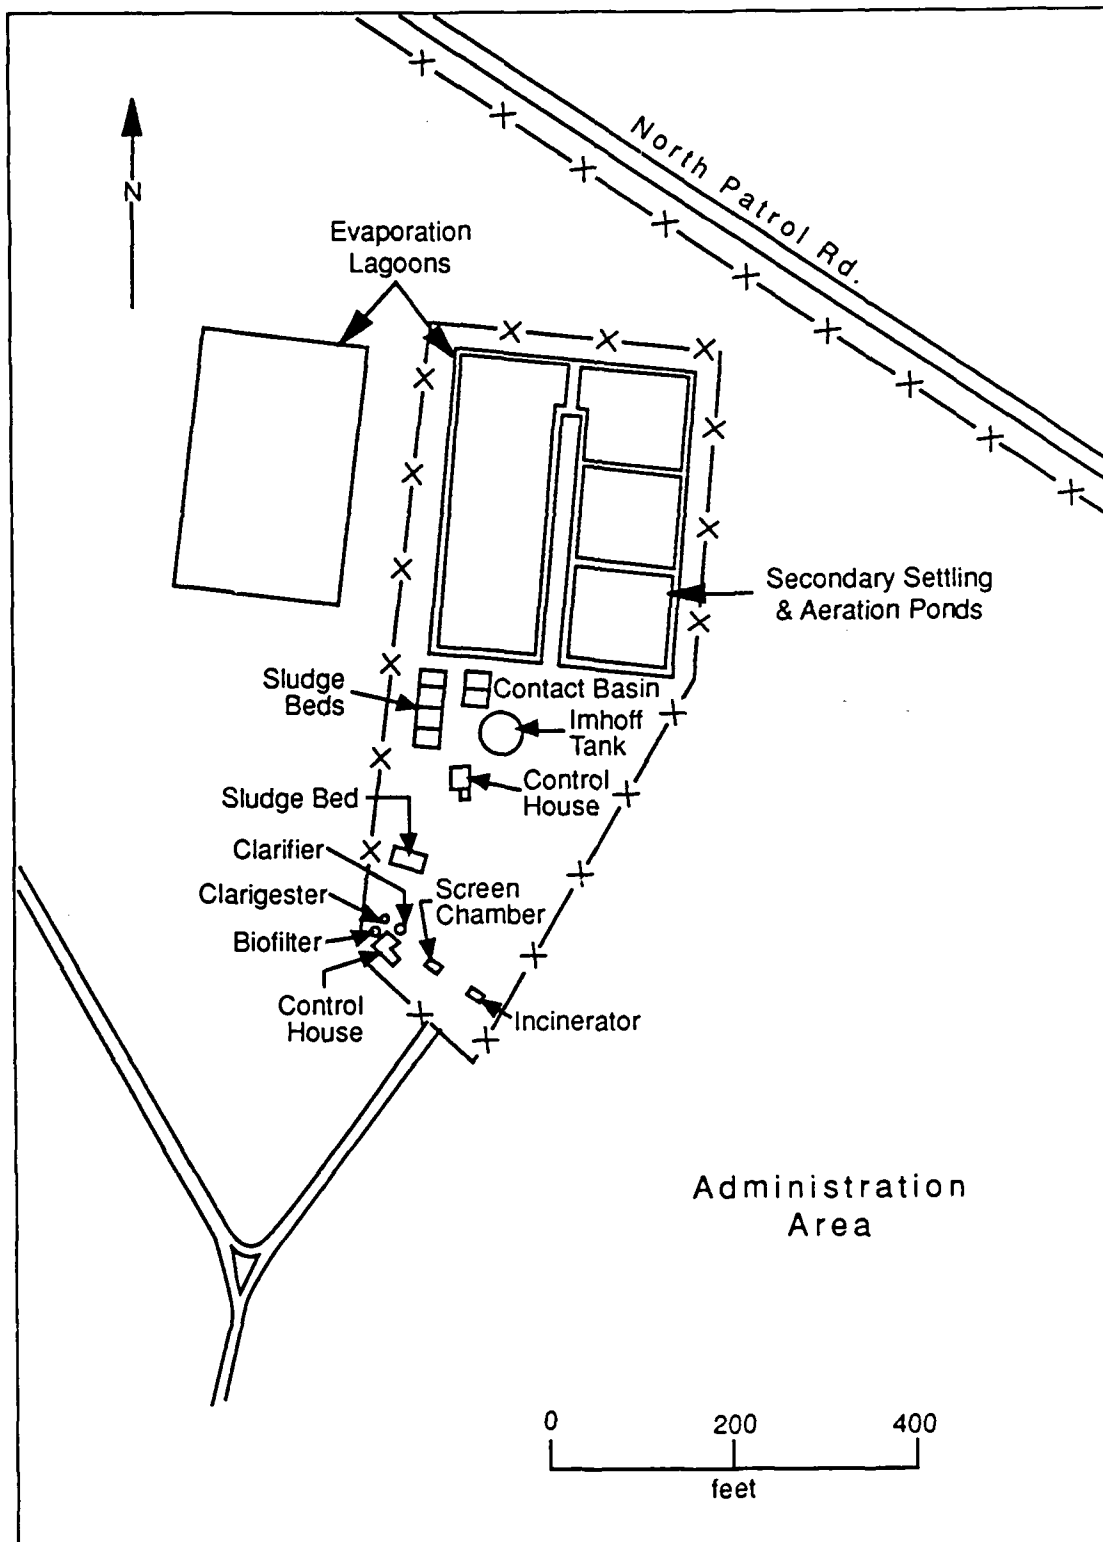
Location of Sewage Treatment Plant (adapted from Ref. 13)
